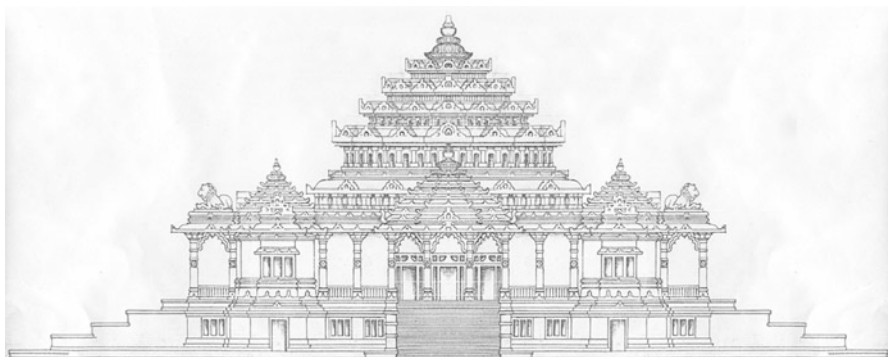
Drawing of proposed front elevation of Vallabh Smarak at Delhi with dome. The external design of the actual temple building was realized with a stepped roof, 1979. Drawing by Amrutlal Mulshankar Trivedi
